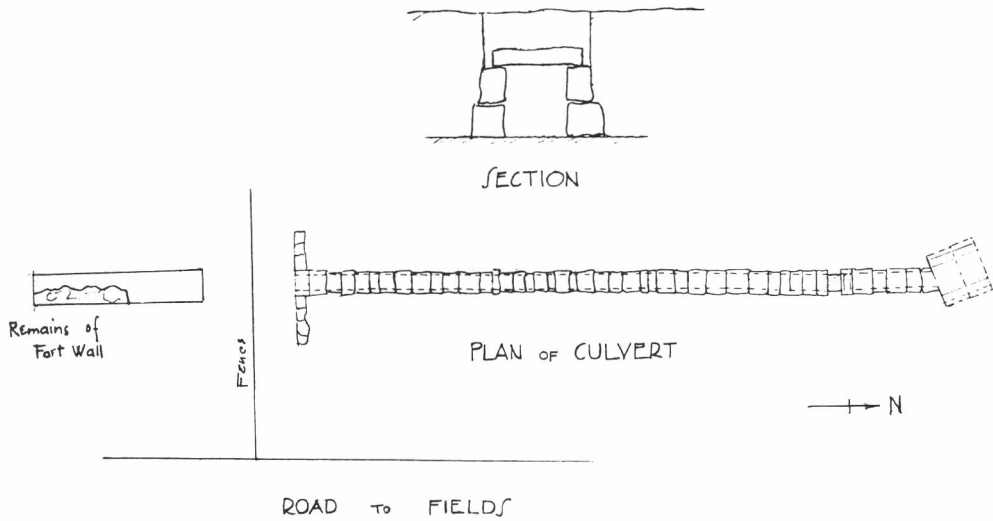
Little Chester, 1926: culvert, plan and section (Sherwin's plan).
